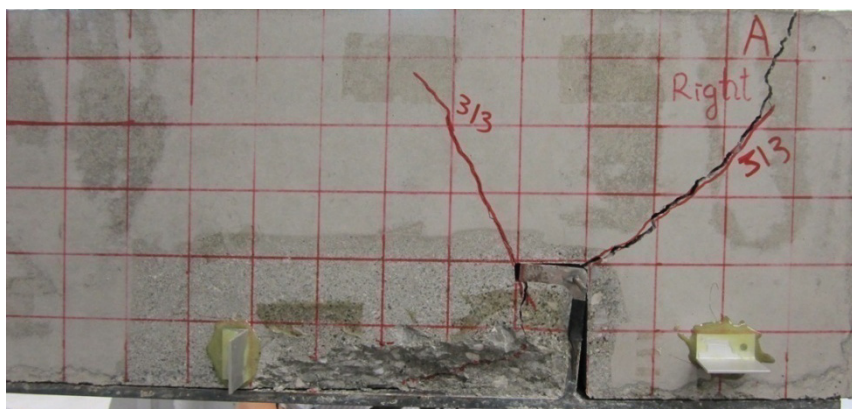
Specimen S-300-100-9-42.7-20 at failure
